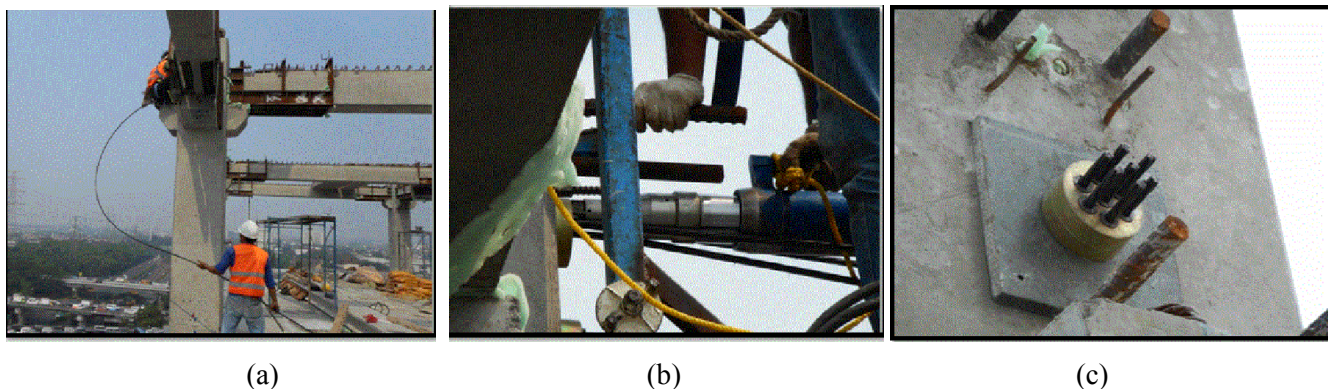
Unbonded post tension, 6(a) strand; 6(b) stressing; 6(c) anchorage
